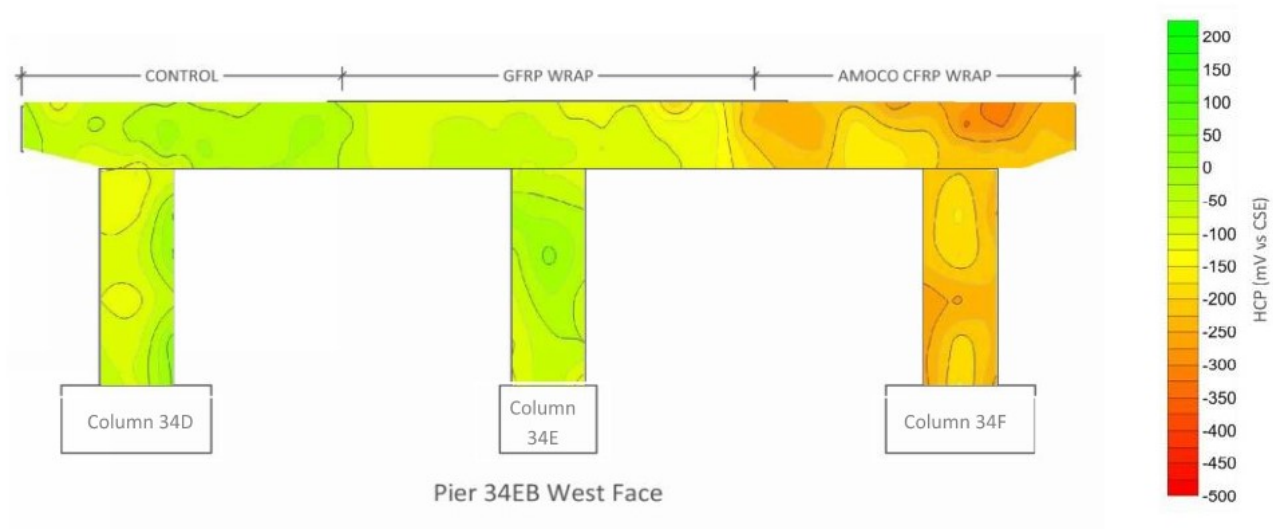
Pier 34EB - Results of half-cell potential testing at west face
